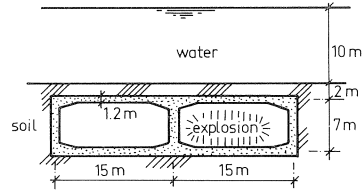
An example of a road tunnel under a waterway, as constructed in the Netherlands.
